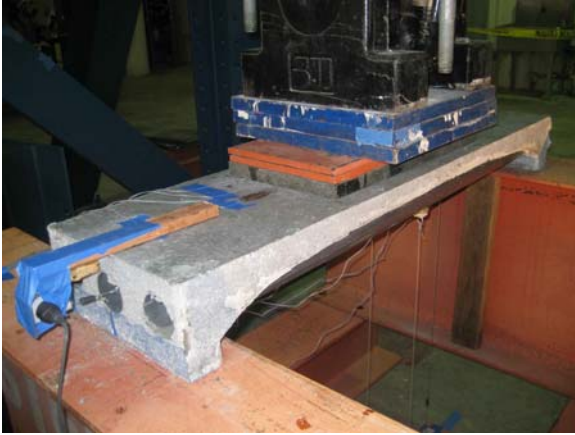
Test Setup for the Tapered Section UHPC-FRP Deck Specimen
